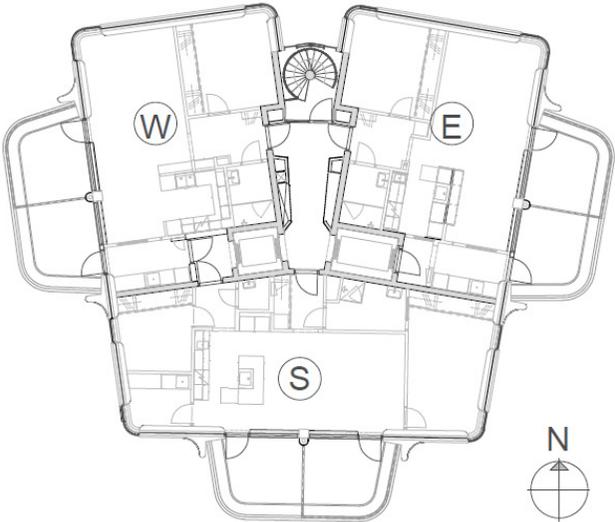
A typical floor of Höghuset showing the three apartments oriented to the west (W), south (S) or east (E)
